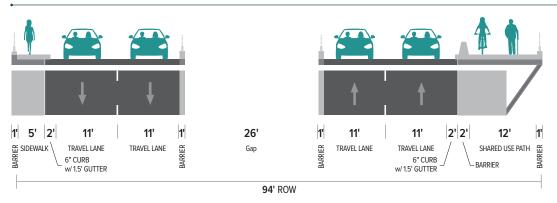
ALTERNATIVE 2 – OVERPASS/BRIDGE/INTERCHANGE STRUCTURE
